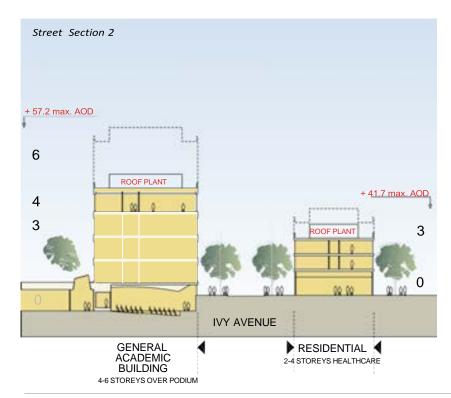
Section 2 illustrates a section along Ivy Avenue, again through the general academic building shown in Figure 4.8 and a 2-4 storey healthcare building on the north side of the Avenue. Figure 4.6 establishes that the buildings will be a maximum of 57.2 and 41.7 metres above ordnance datum respectively, including any rooftop plant.
